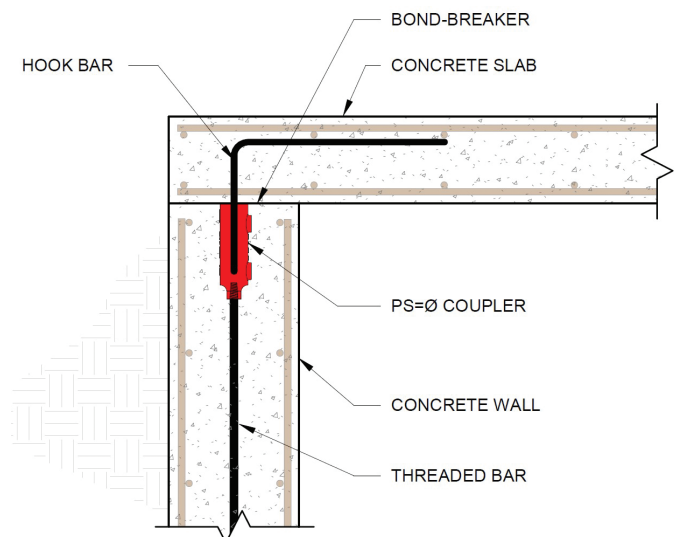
PS=Ø slab-to-wall restraint relief joint over wall
